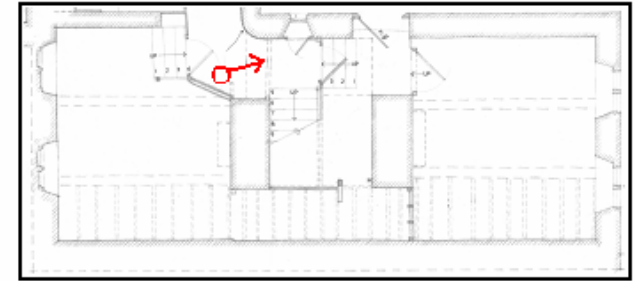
South range: First-floor joists, showing the location of samples YRD-F18–27 (John Allan)
